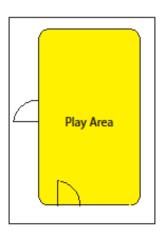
Brenner's 9th floor Play Room Plan. Not to scale.
